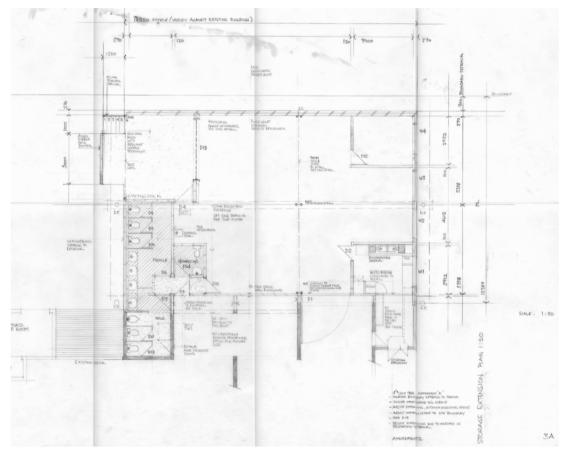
Floor Plan, Art Gallery Extension, 1988, Gary W. Fidler Architect
